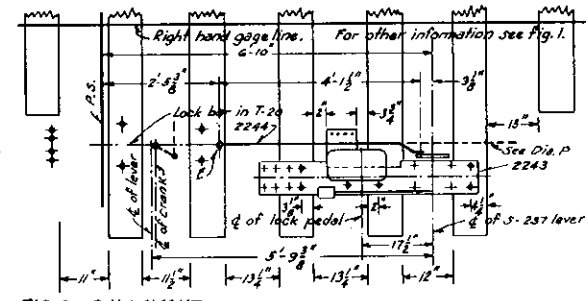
R.H. LAYOUT 30 FT. SWITCH RAIL - 3 HOLE 130 LB. RAIL.
